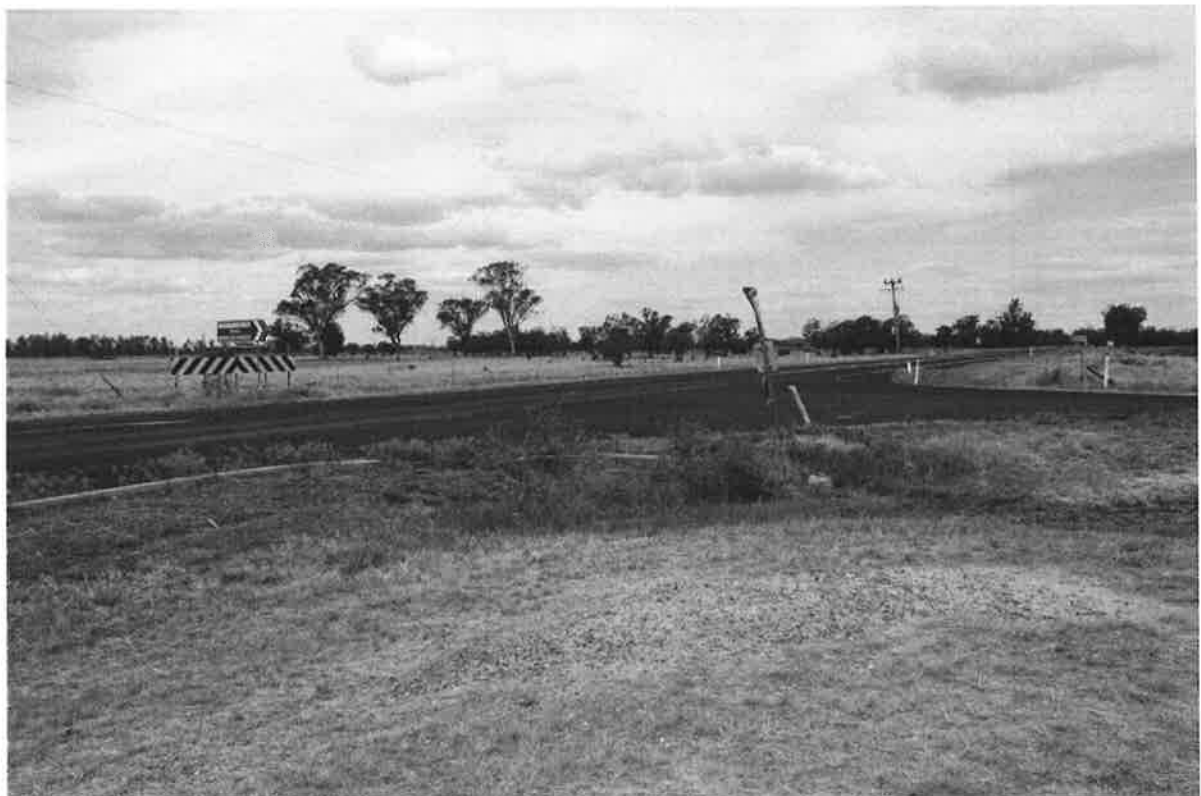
Damage to sign, kurb and culvert head wall – west bound warrant
